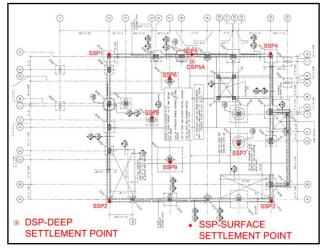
The plan view of the foundations for Building E2 and the location of the settlement markers
